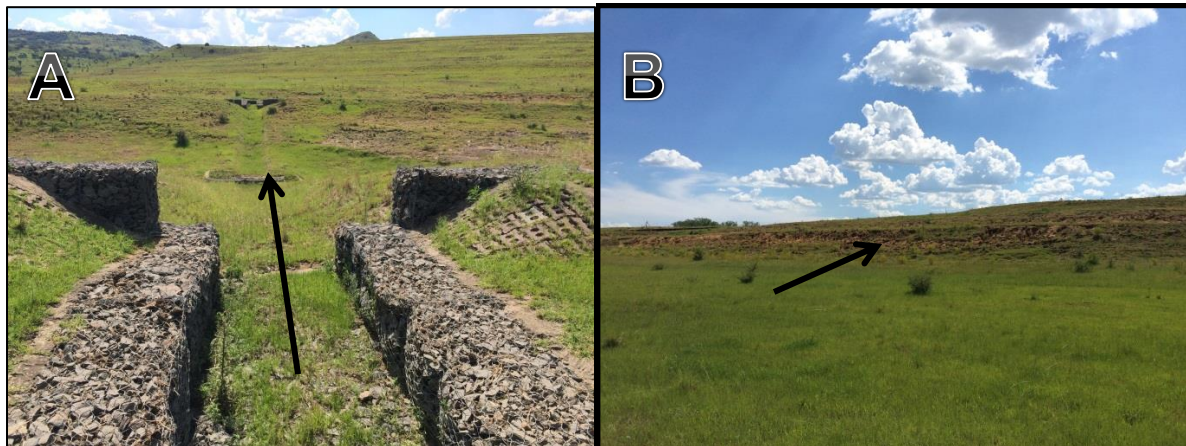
Open Pit area 1A down-drain (A) and soil erosion (B)
